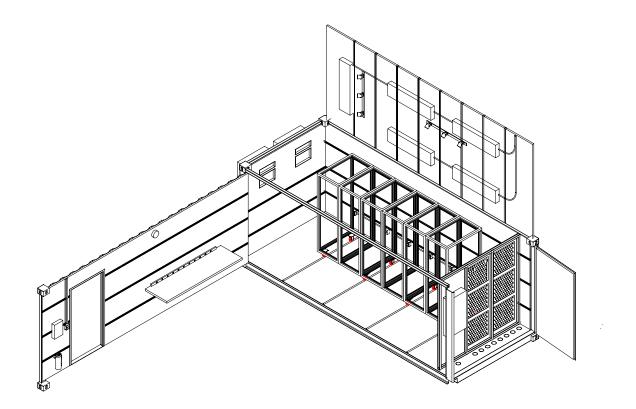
Conceptual drawing of the LWA shelter. This is not a drawing intended for fabrication purposes, but indicates the general layout of the shelter.
